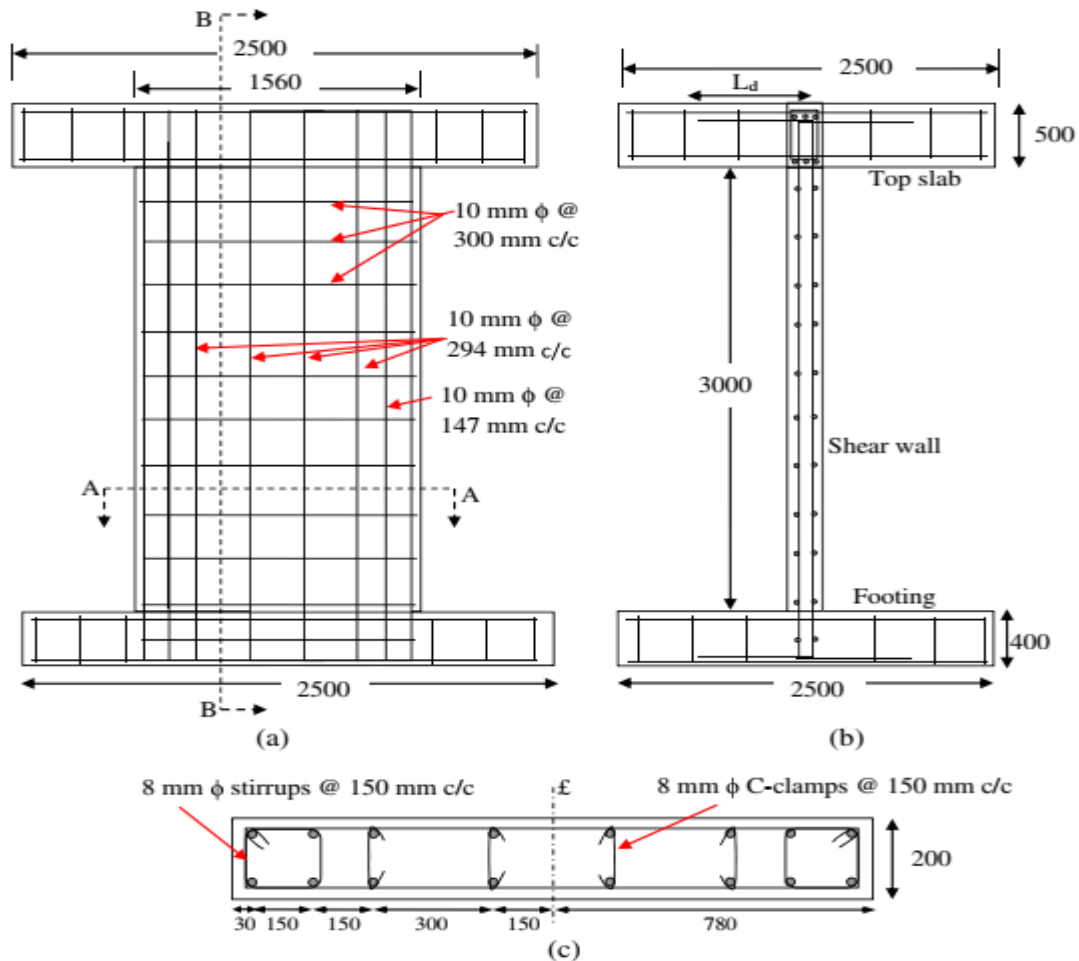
Structural details of the shear wall: (a) elevation; (b) section B-B; (c) section A-A (all dimensions shown are in mm, drawn not to a scale)
